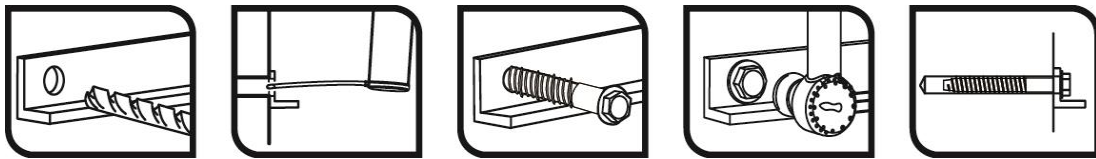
shows the installation steps for prestressed hollow core concrete slabs. Firstly, determine and mark positions of the tensiing strands, and then keep distance.
